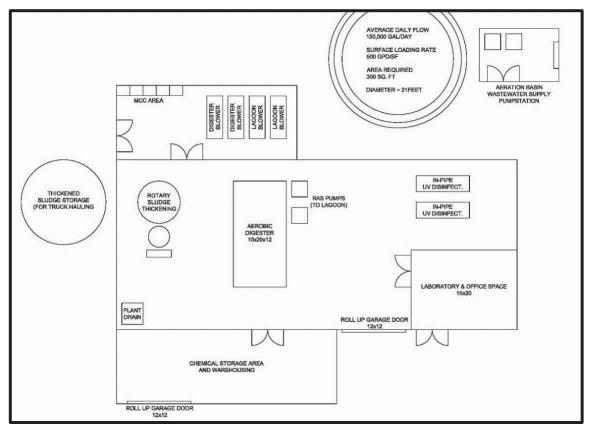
Conceptual Building Layout for Alternative 4 - Extended Air Activated Sludge Process
